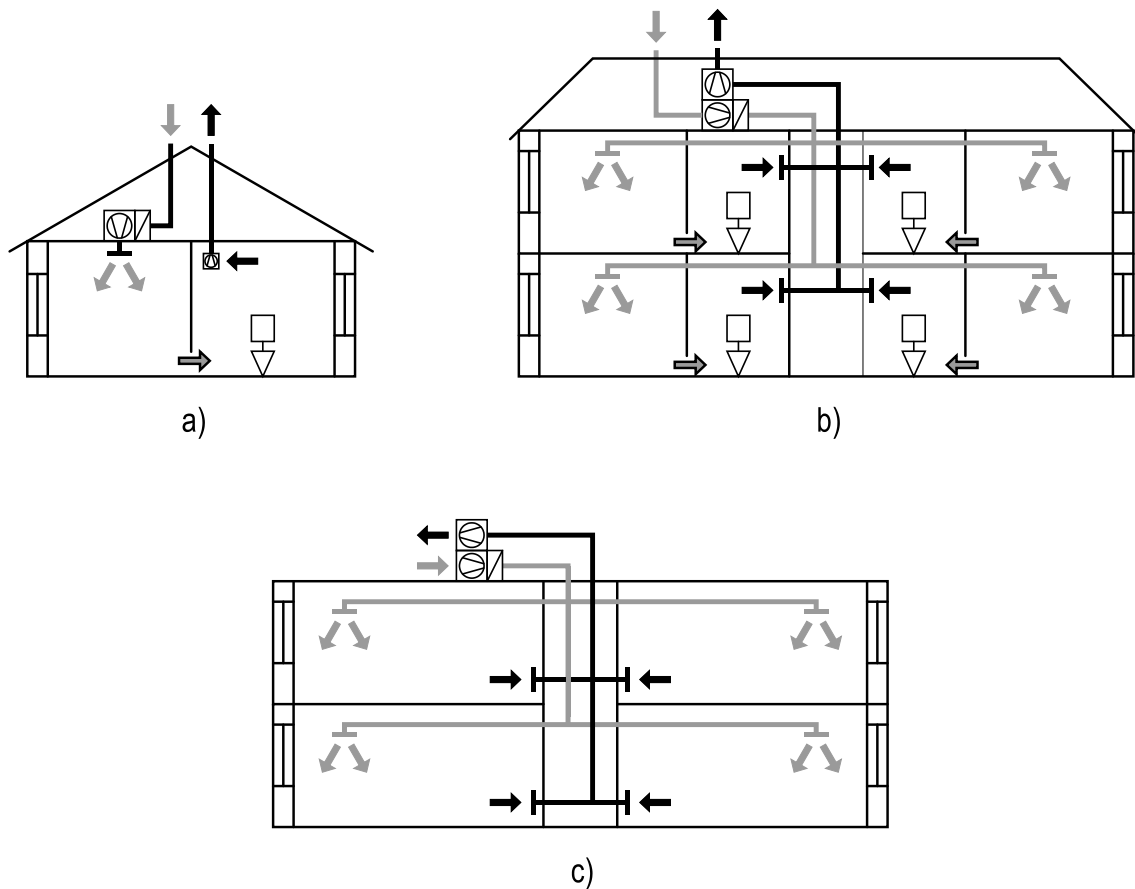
Ventilation system 3C1: a) house; b) apartment building; c) office building
